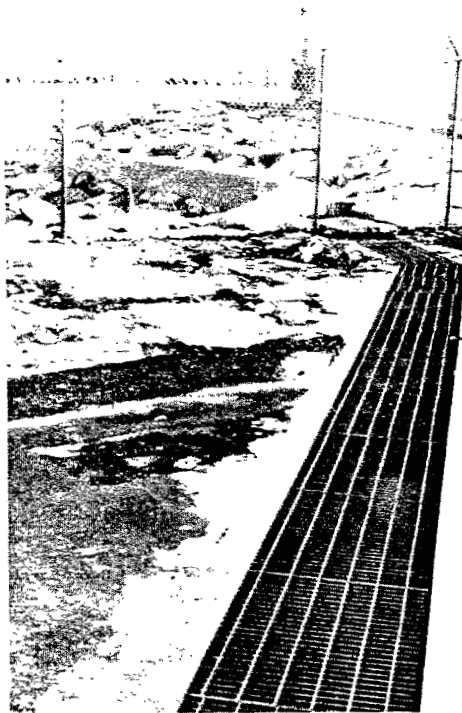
The 300 foot long Pilgrim Station, concrete screenwash sluiceway is molded from 18" corrugated metal pipe, and meanders over breakwater rip rap.
